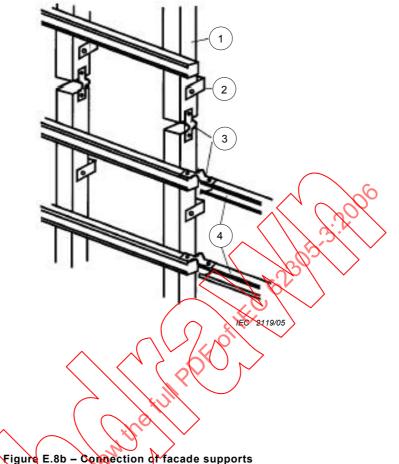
Use of metallic facade as natural down-conductor system and connection of facade supports
